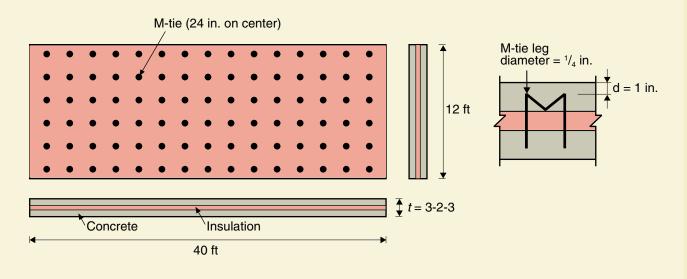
This figure shows a 3-2-3 precast concrete sandwich panel. The concrete wythes are connected by M-ties. Note: Drawing is not to scale. 3-2-3 is in inches. 1 in. = 25.4 mm; 1 ft = 0.3048 m.
